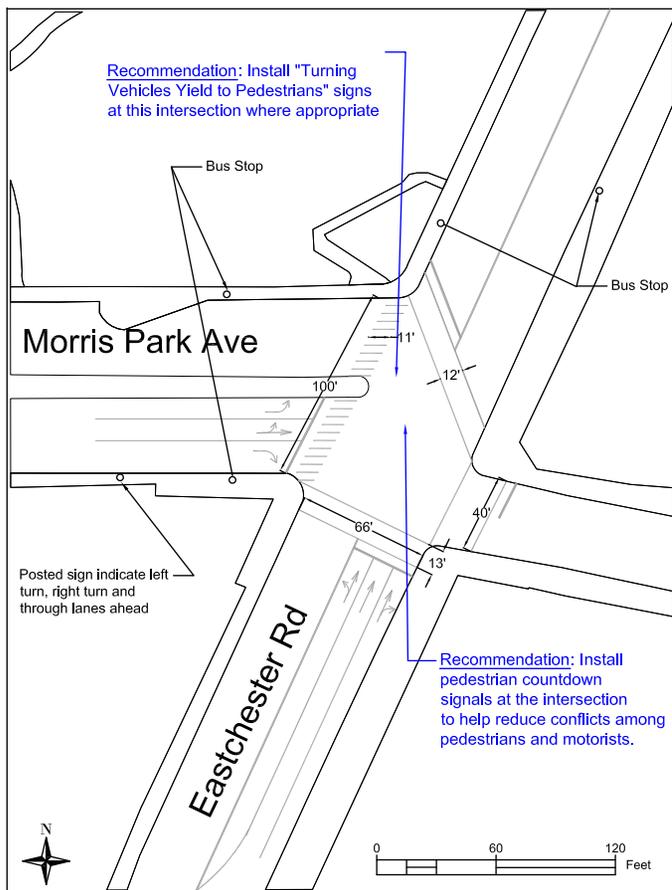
Intersection of Eastchester Road and Morris Park Avenue (with proposed improvements)
